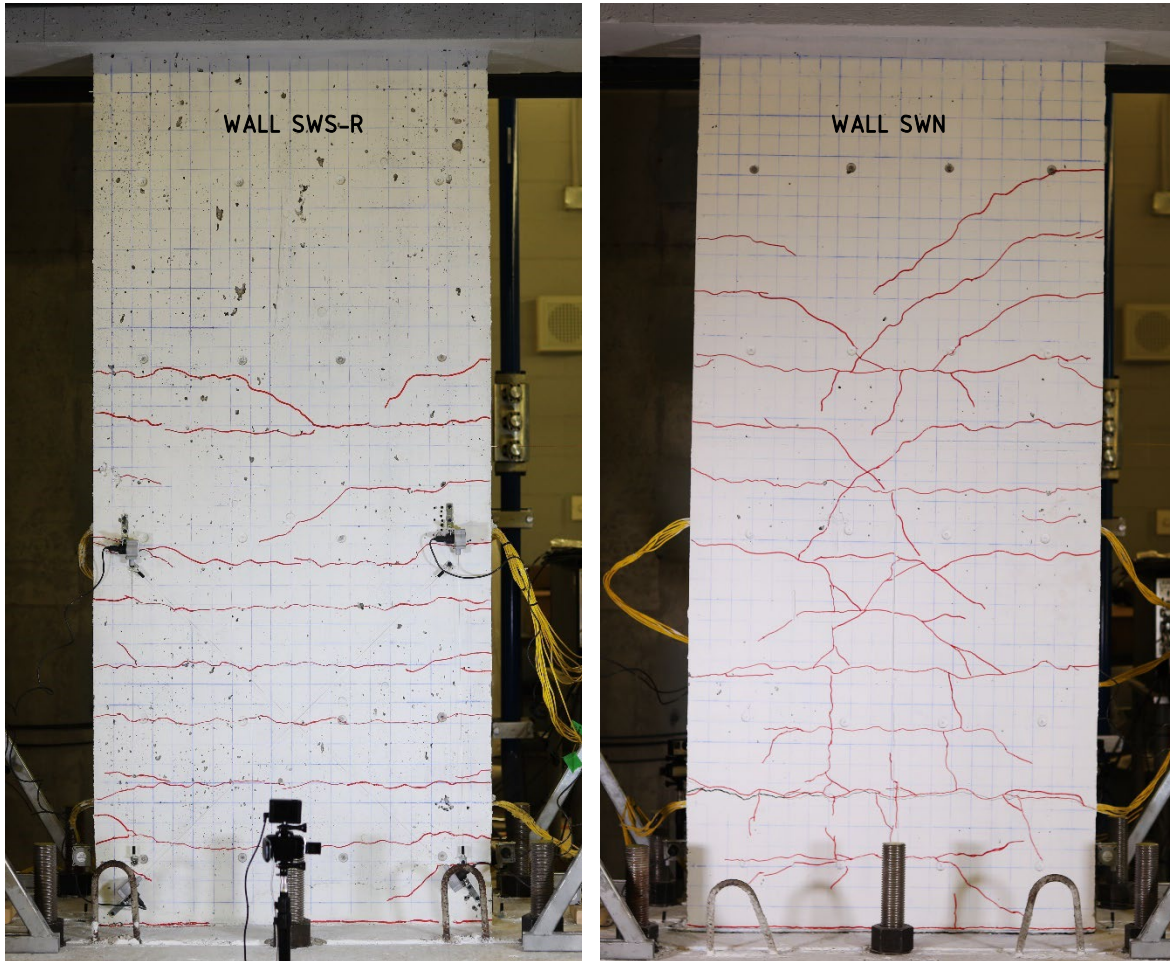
Crack patterns at yielding of walls SWS-R (left) and SWN (right).
